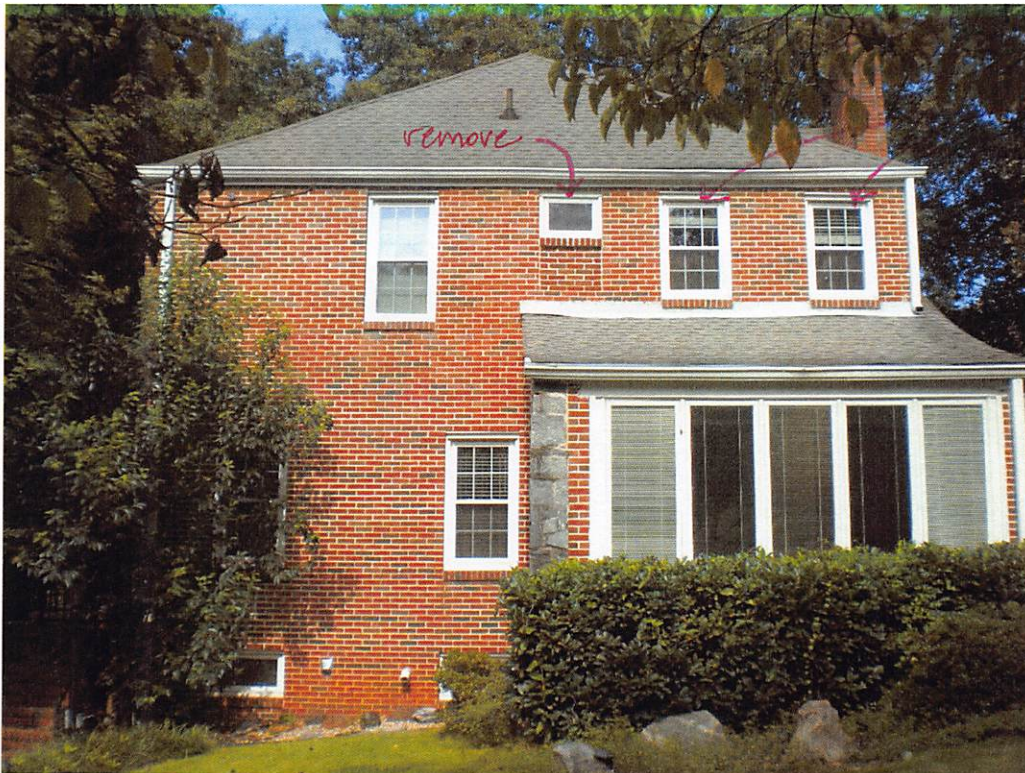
Side view of house from Ridgewood Drive showing two window sashes to be replaced and one window to be removed
